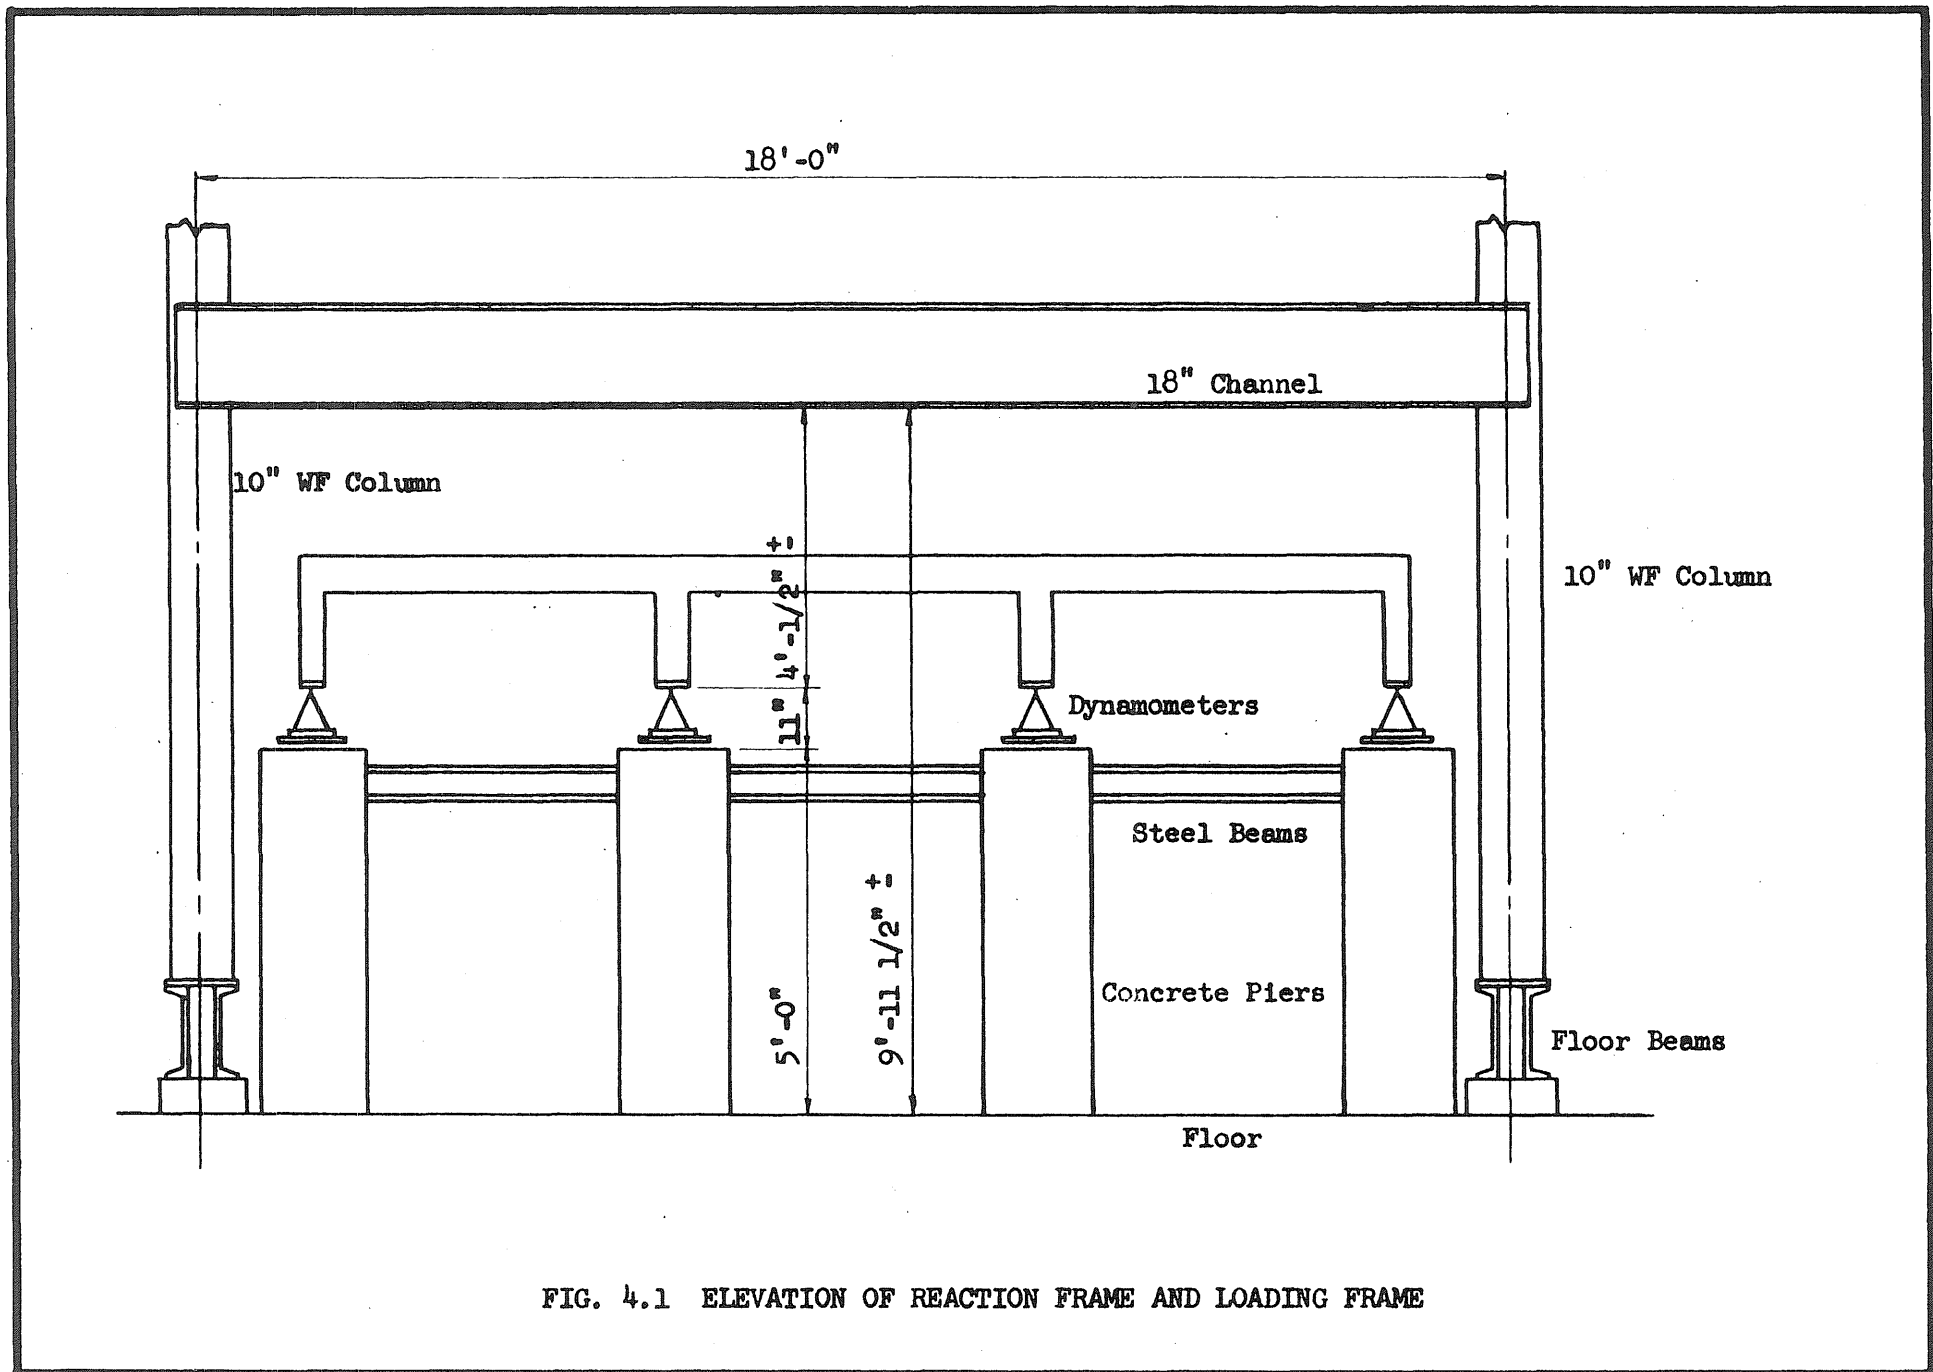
ELEVATION OF REACTION FRAME AND LOADING FRAME
